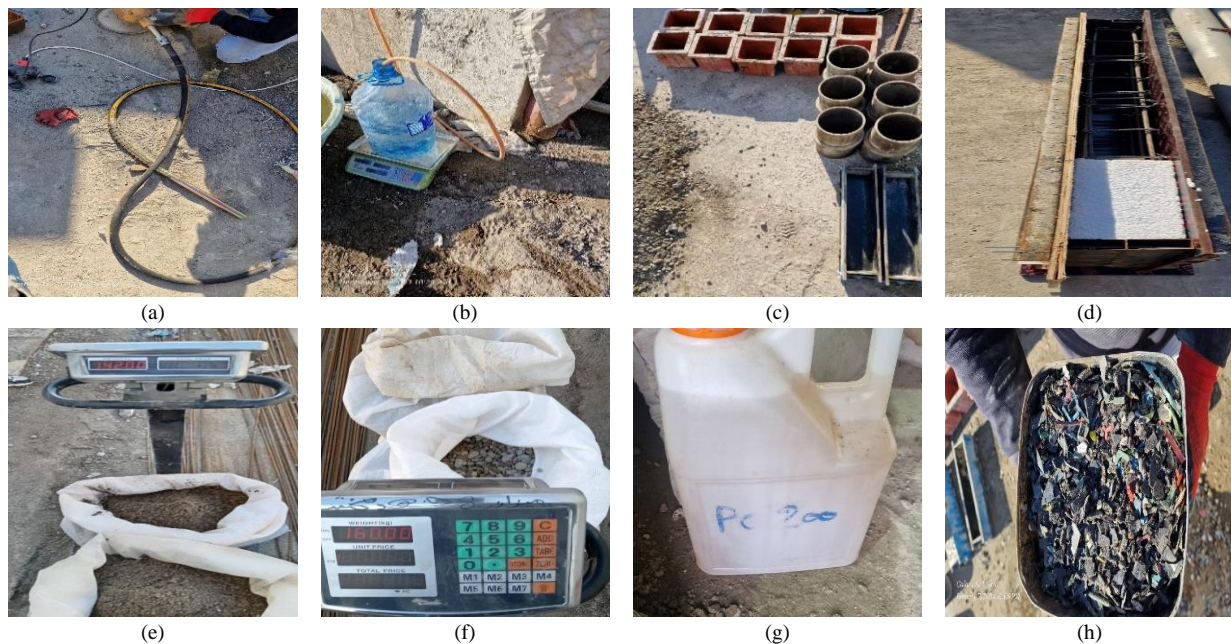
Formwork for reinforced concrete beams and test moulds, and whatever else is needed: (a) prepare vibrator before casting, (b) weighting the water, (c) prepare test moulds before test, (d) supply moulds of deep beam, (e) weighting sand, (f) weighting gravel, (g) supply superplasticizer, (h) supply recycled plastic.
